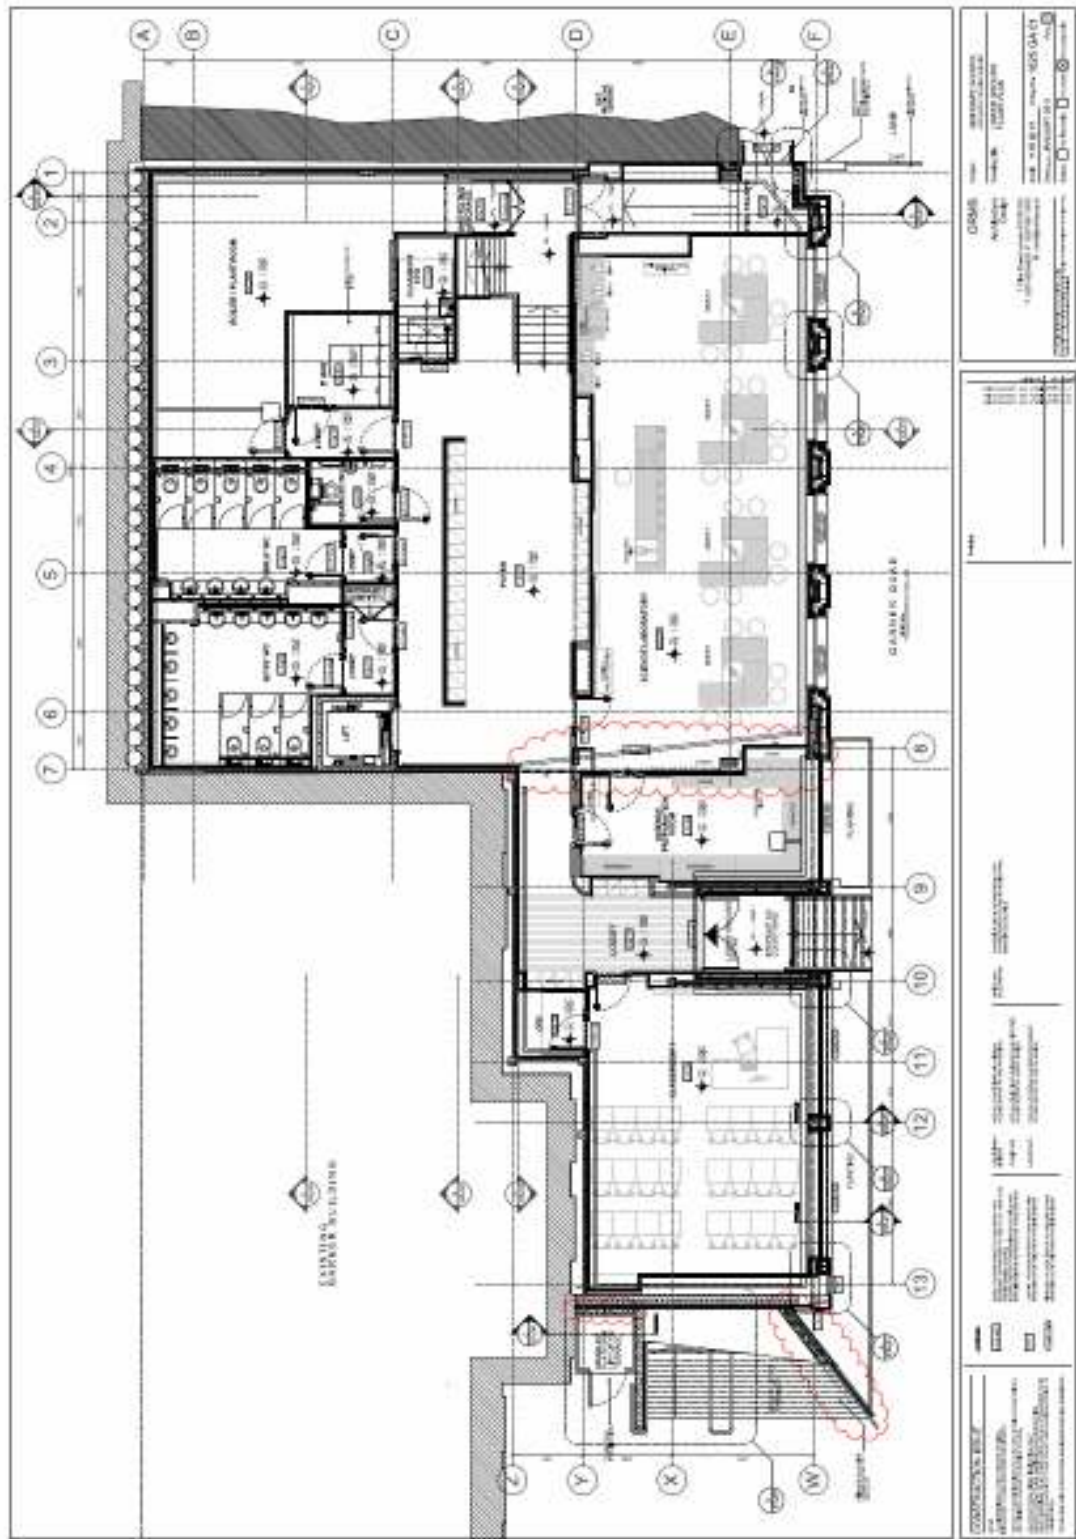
Ground floor plan of development (ORMS, January 2011).
